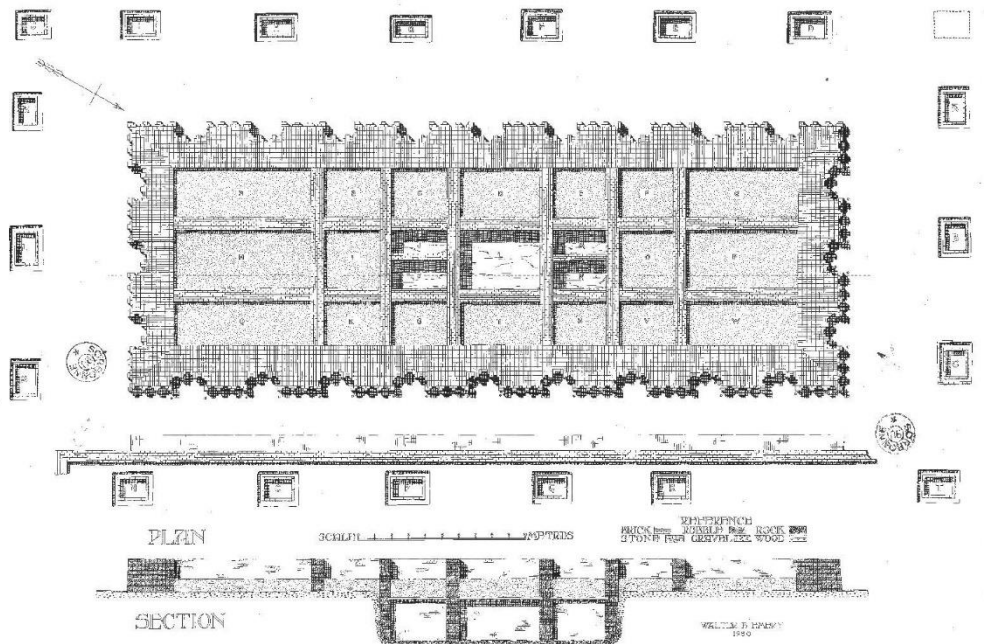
Plan of Tomb 3503 at Saqqara, surrounded by individual subsidiary graves (Emery 1954, plate XXXVIII).
